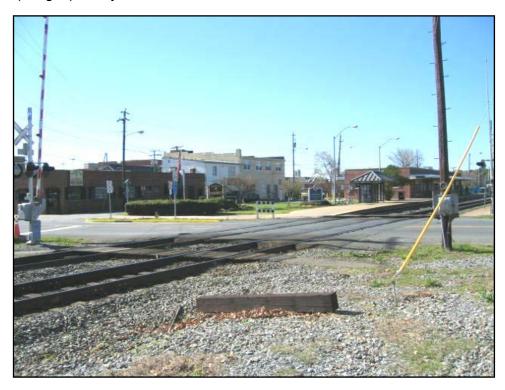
Drainage structure (obscured by vegetation) under track. Such structures will require extension or replacement as part of third track construction.
